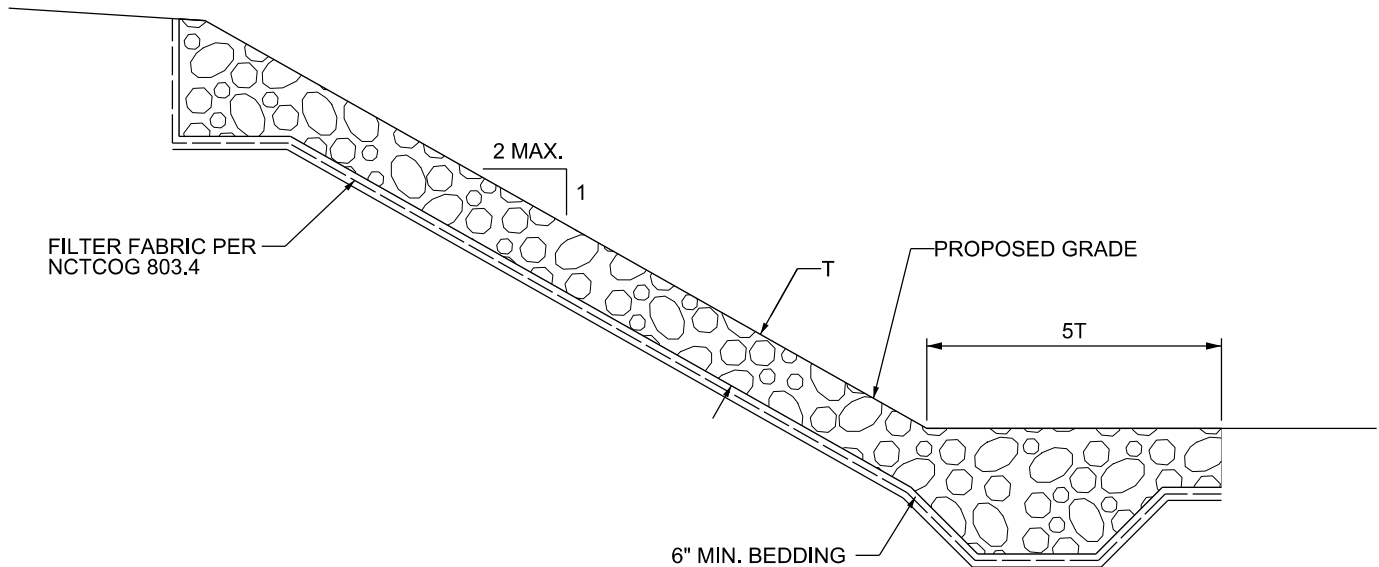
SCHEMATICS OF EXCAVATED STONE OUTLET SEDIMENT TRAP (2 OF 2)
